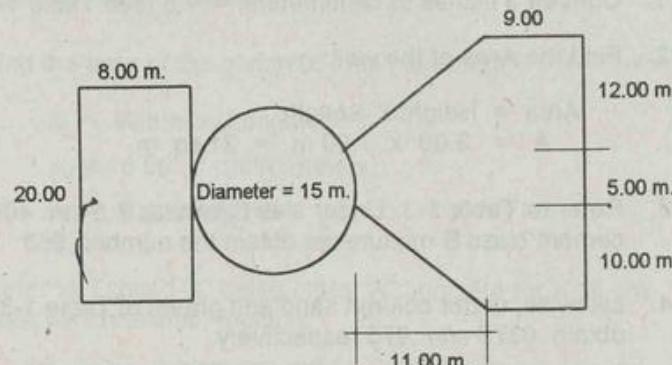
CONCRETE PAVEMENT PLAN
